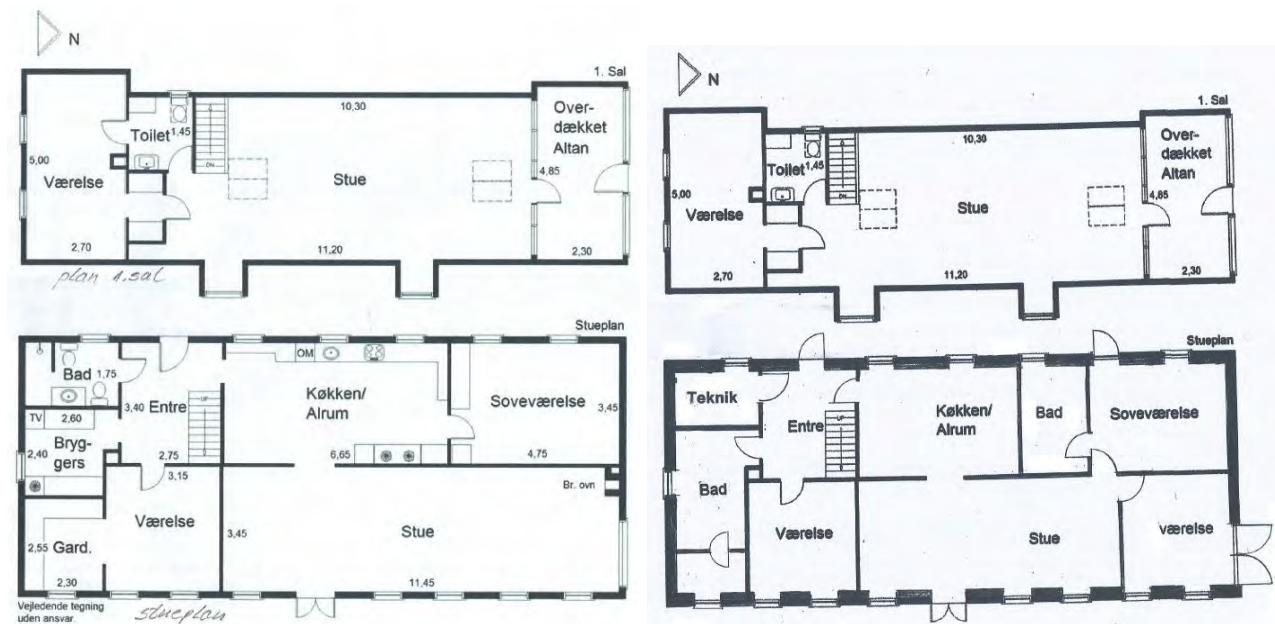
Upper floor plans (top) and lower floor plans (bottom) before (left) and after (right) renovation
